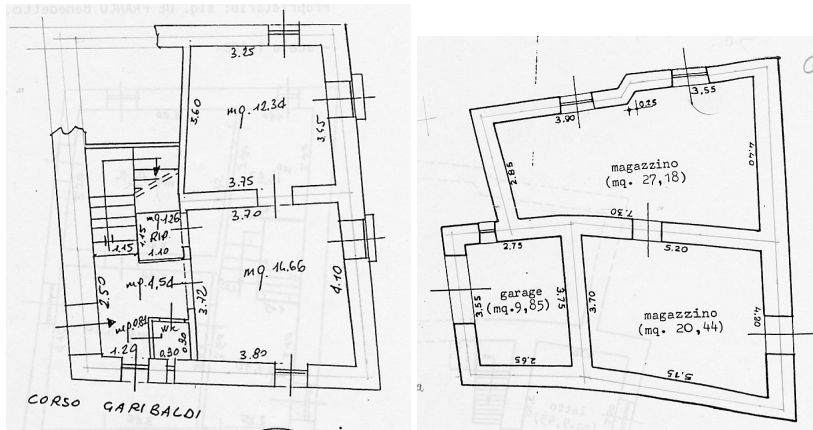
Two typical plan layout of the buildings of Laino, at ground level; shapes are often simple and compact.
